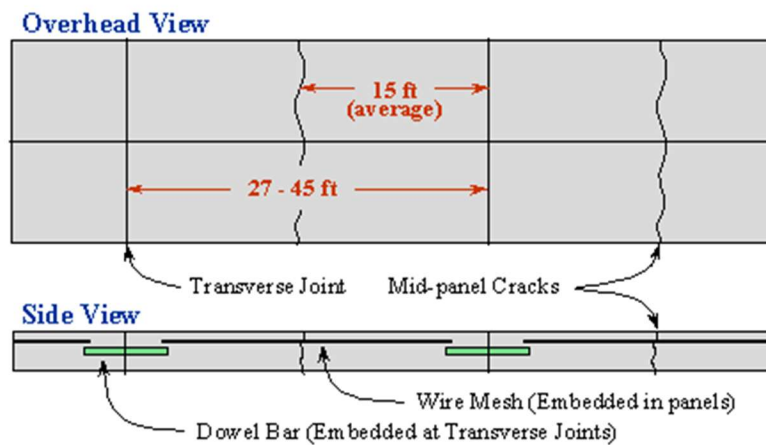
Cross-section and top view of Jointed Reinforced Concrete Pavement [76]
